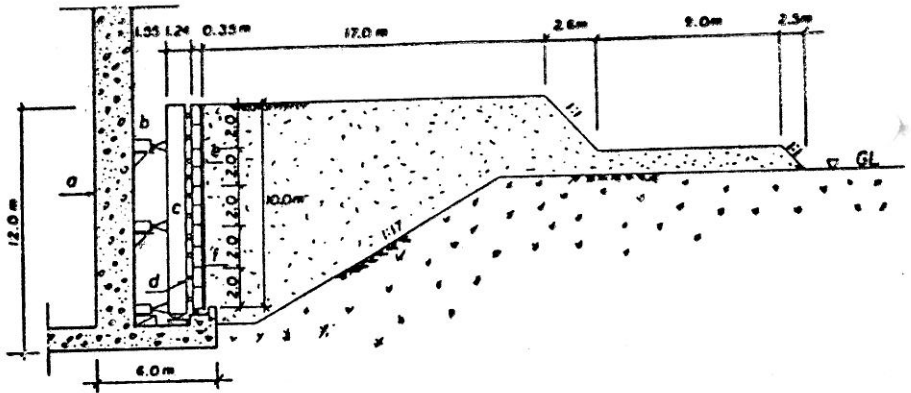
Gravity Retaining Wall Set-up used by Matsuo et al. (1978).
